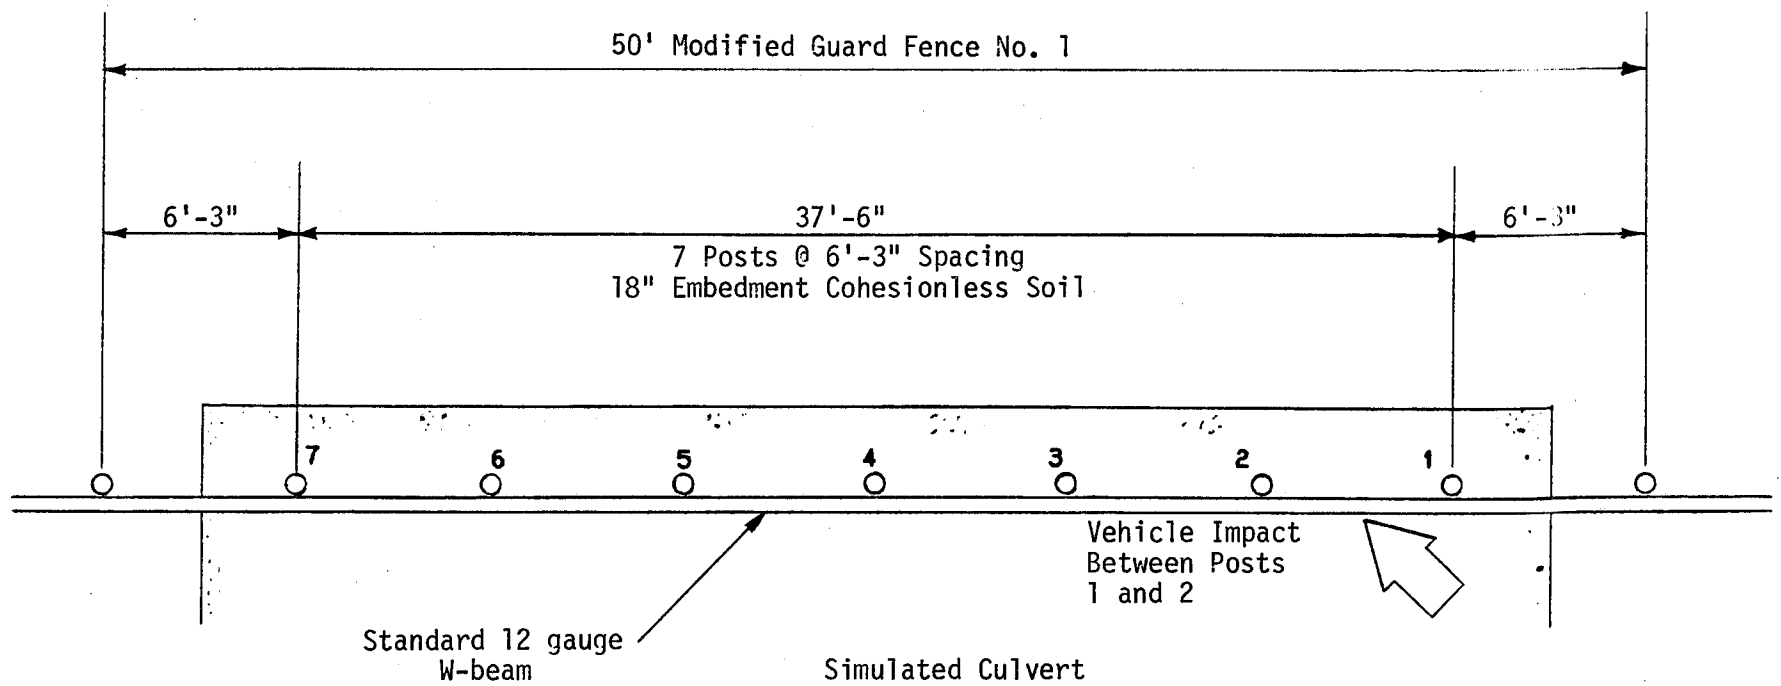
PLAN VIEW OF MODIFIED GUARD FENCE NO. 1
